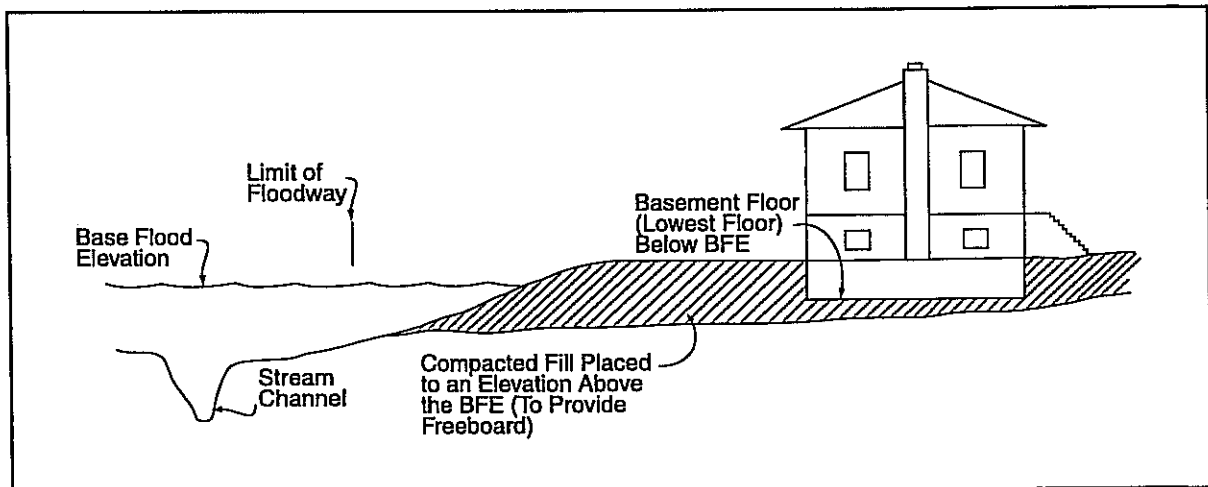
Basement foundation in fill placed above the BFE. The depth of the basement floor below the BFE is less than when no fill is placed.
